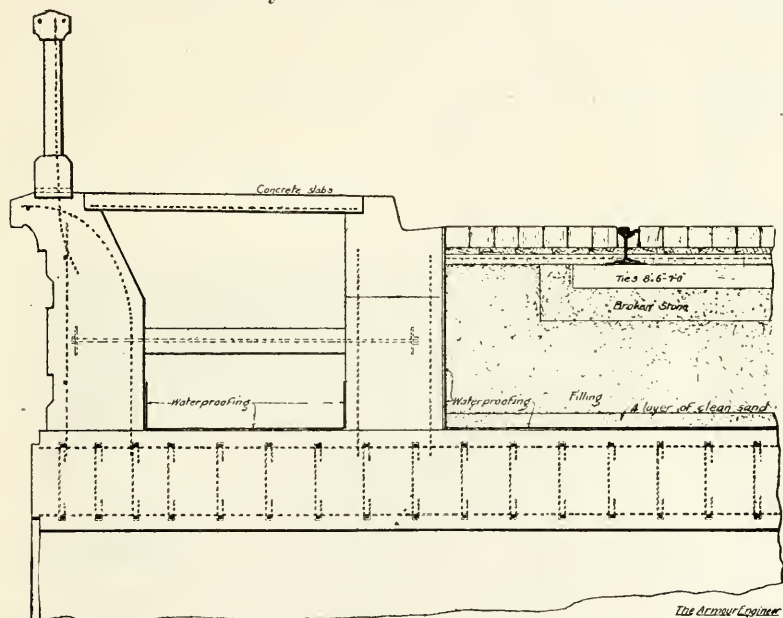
GENERAL CROSS SECTION THROUGH HAND RAILING, SPANDREL WALL AND ARCH RING.
